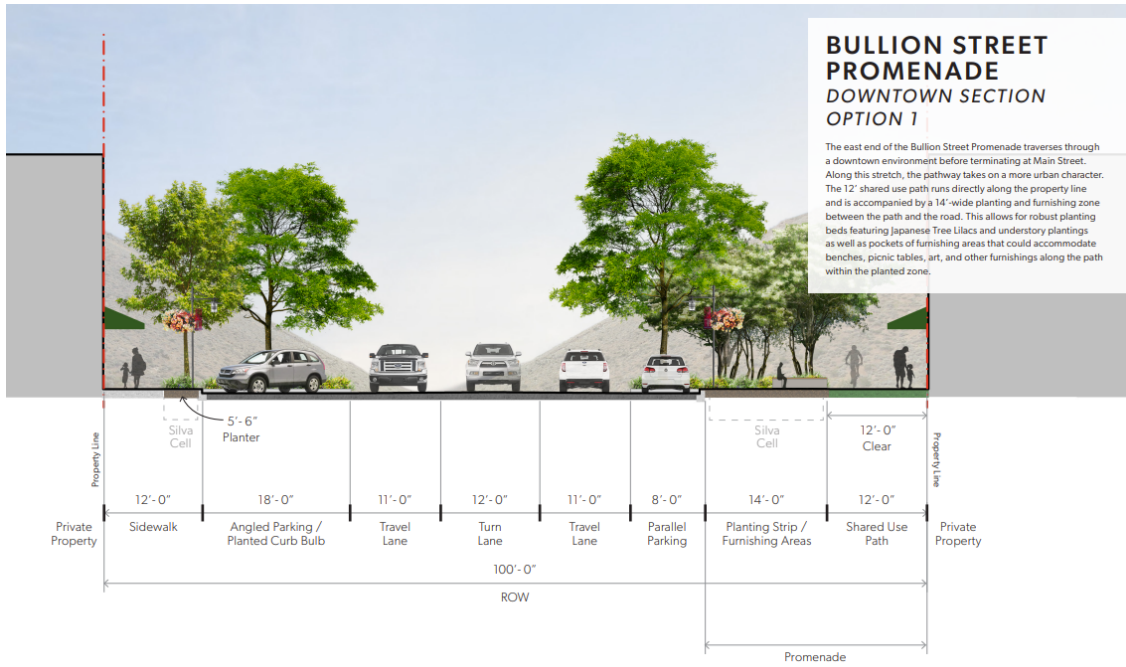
Bullion Street Promenade sections from approved Downtown Hailey Master Plan (Main to Alley: Section Option 1; Alley to Hop Porter Park Section Option 2)
